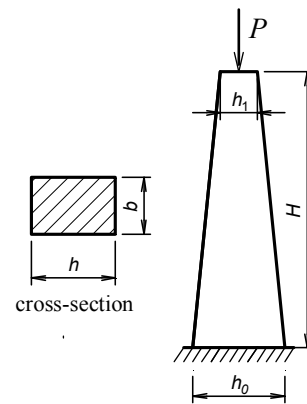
Linearly tapered cantilever columns with a concrete rectangular cross-section.
